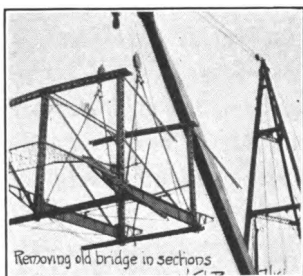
Removing old swing span. Washington Street Bridge, Norwalk, Conn.
